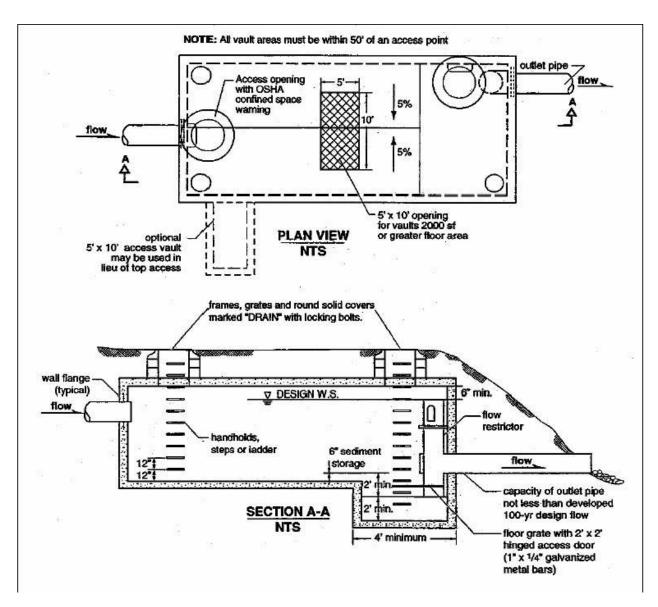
Example Underground Detention Tank System Figure 2.2.11-2 Schematic of Typical Underground Detention Vault
